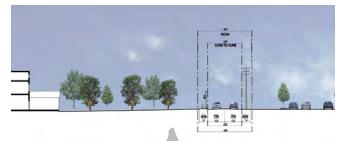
Rue St. Francois @ City Hall, Existing
